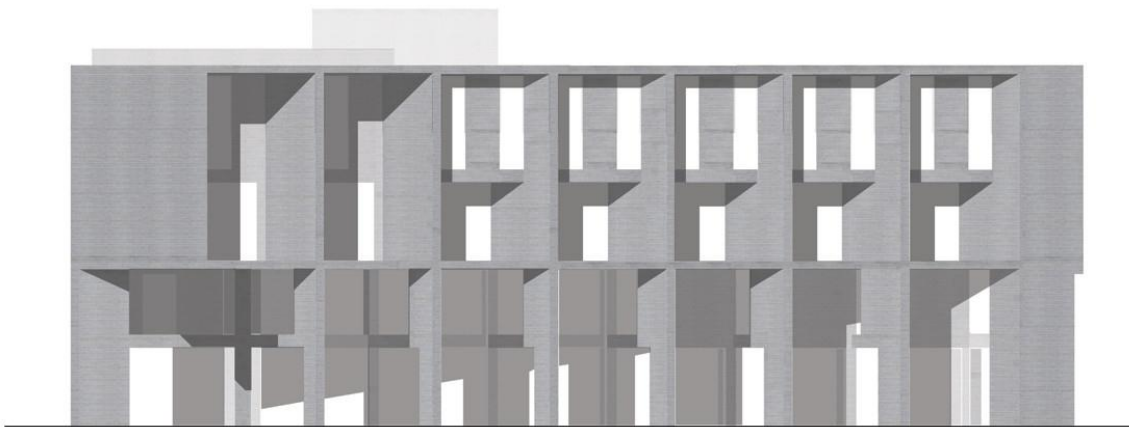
F - University of Limerick Medical School - Academic Building Elevation
